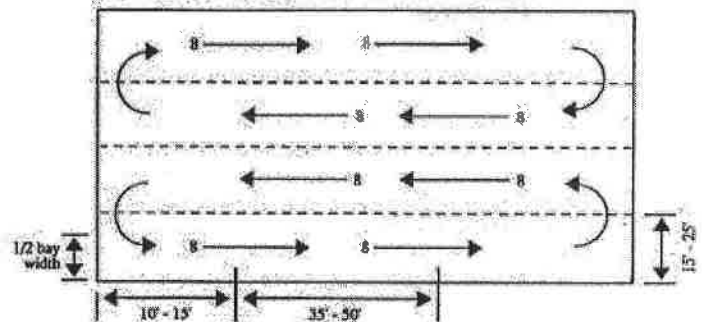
Typical HAF* fan placement (18' diameter) for even number of gutter connected greenhouse bays.
